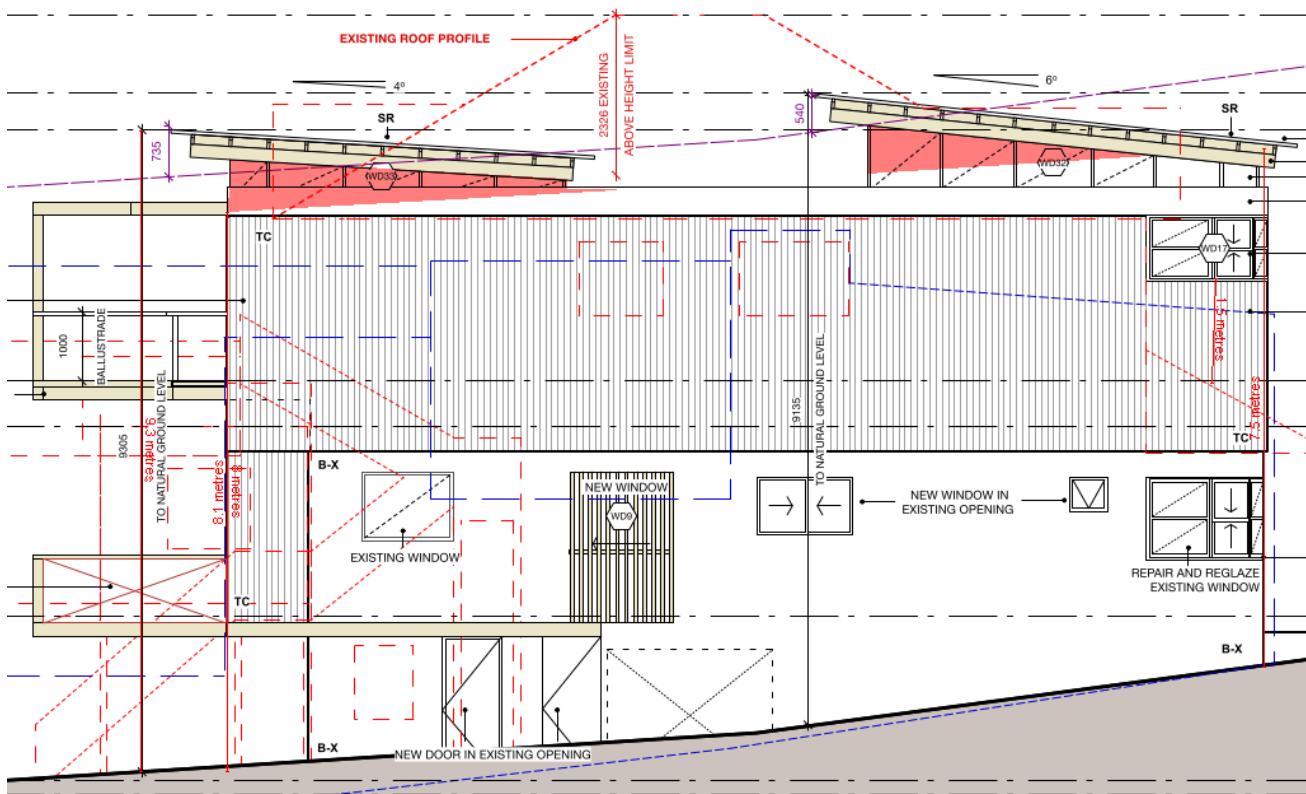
Extract from Western Elevation with side boundary envelope encroachment in red.
